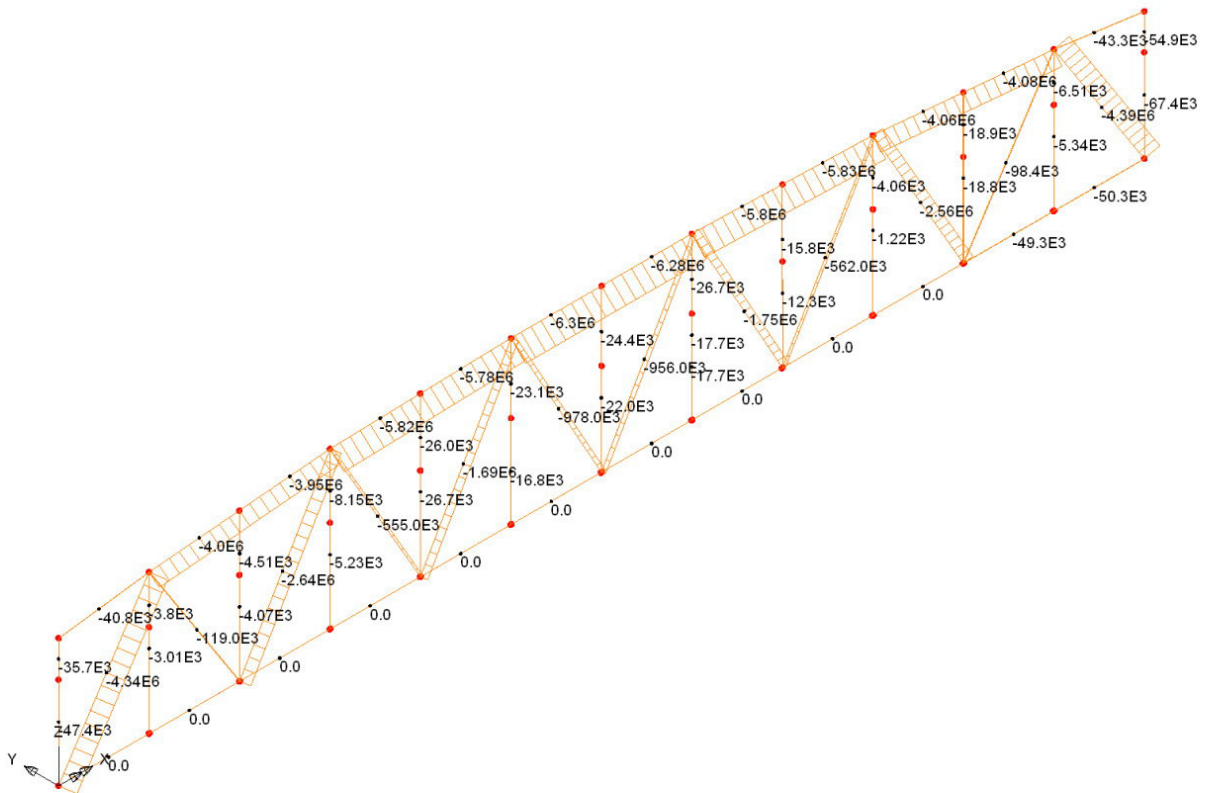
Lift Span Highway Truss Members Axial Forces-Combination 4-Maximum Compression
